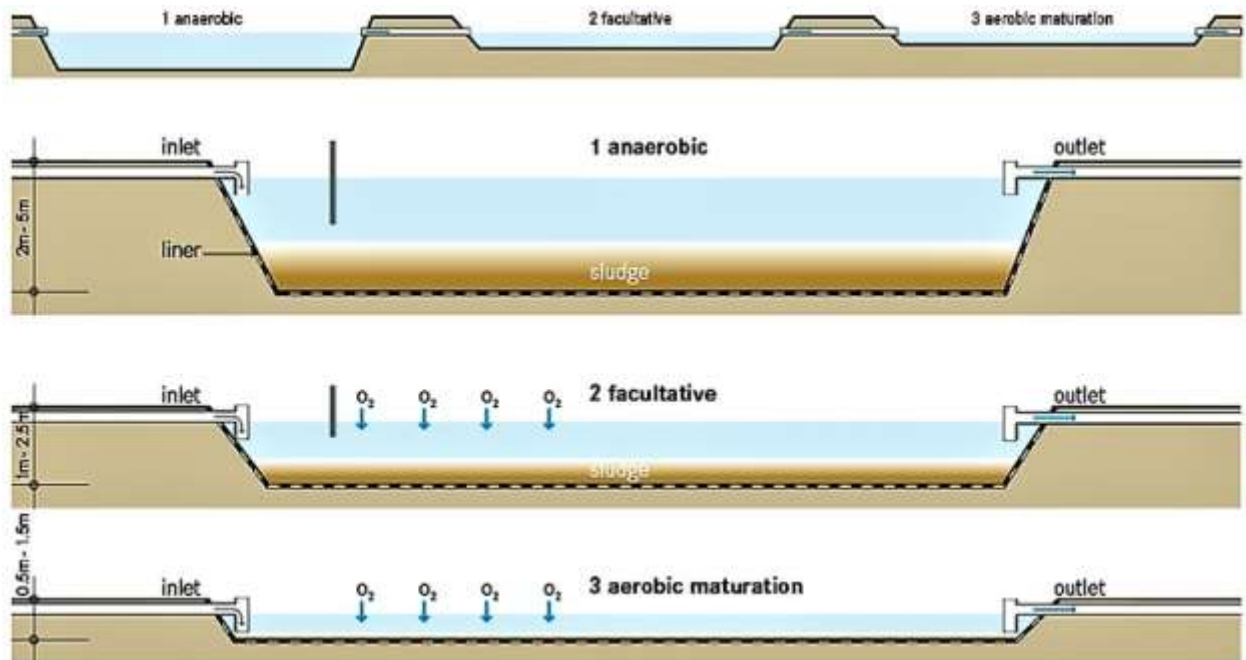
Waste Stabilization Ponds system for Wastewater treatment
